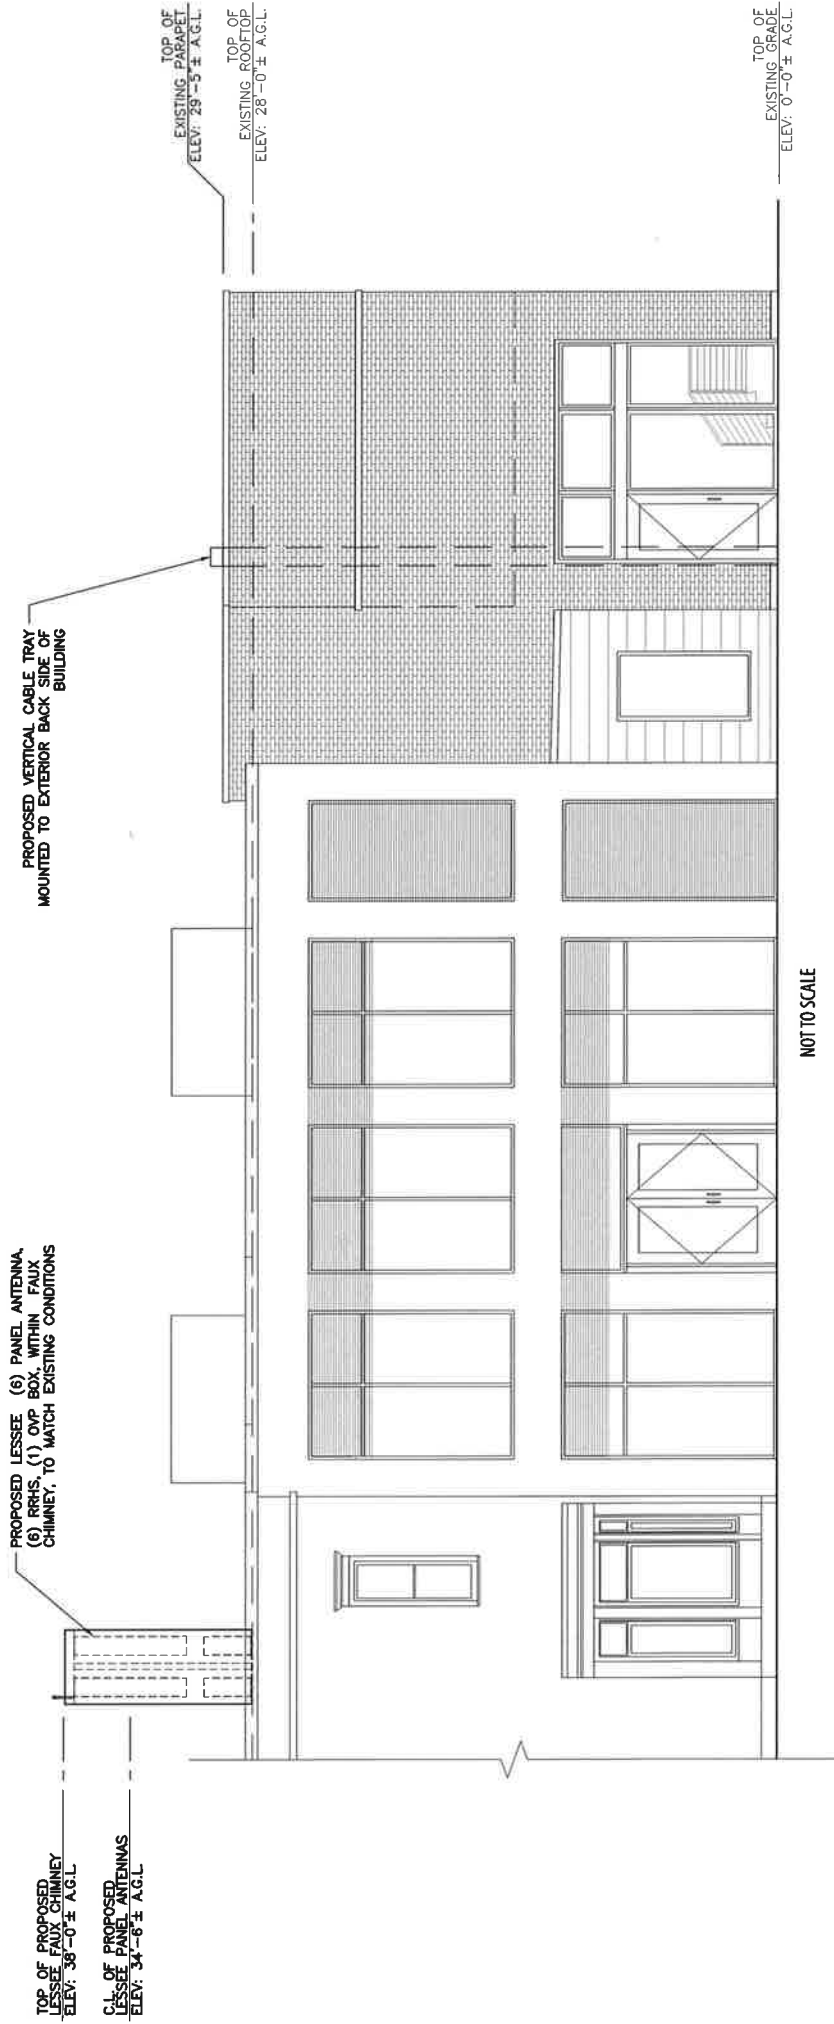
PROPOSED EQUIPMENT LOCATION AND ELEVATION PLAN
